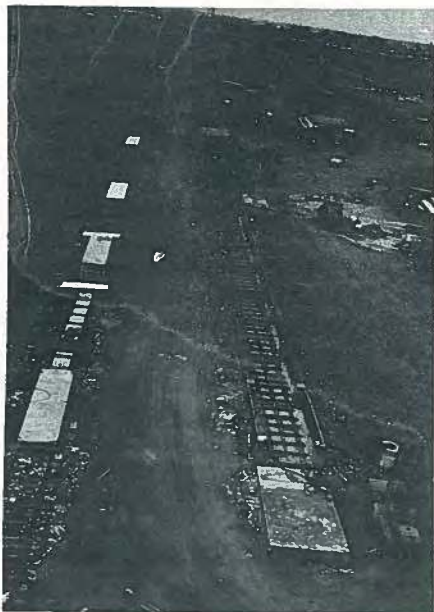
Late in 1952, Prestressed Concrete of Colorado built its first production prestressing bed. (Note: Twin Tee slabs stored to left of bed.) The original 50-ft (15.2 m) bed, built in 1951, proved inadequate for economical production purposes.
